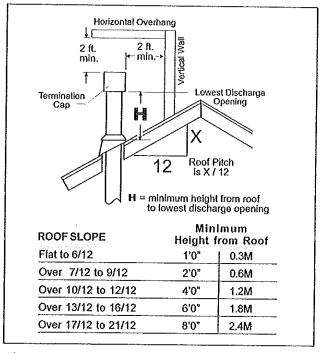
Gas Vent Height Rule: Vertical vent termination height above roof.
